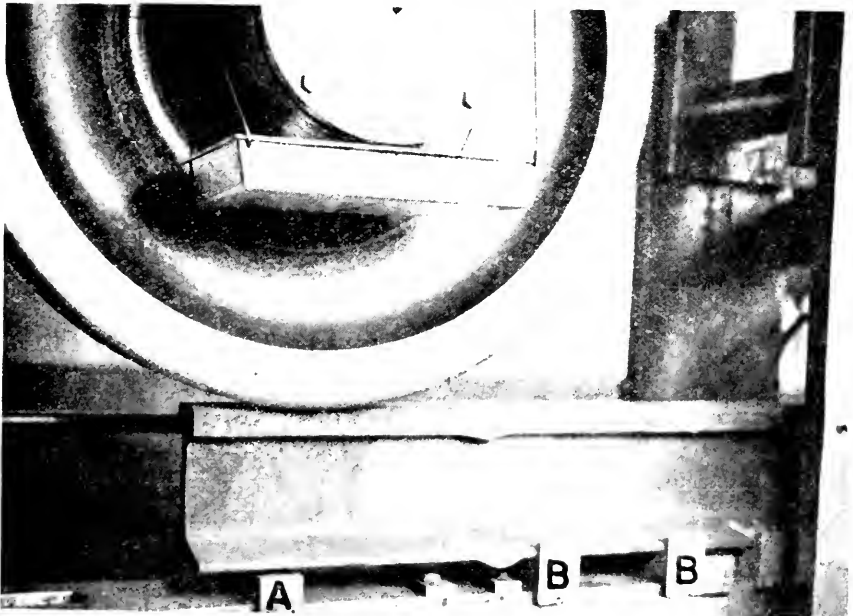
Welded Rail with Wheel on End of Cantilever. Blocks B support the rail and block A is used only after rail fails.
